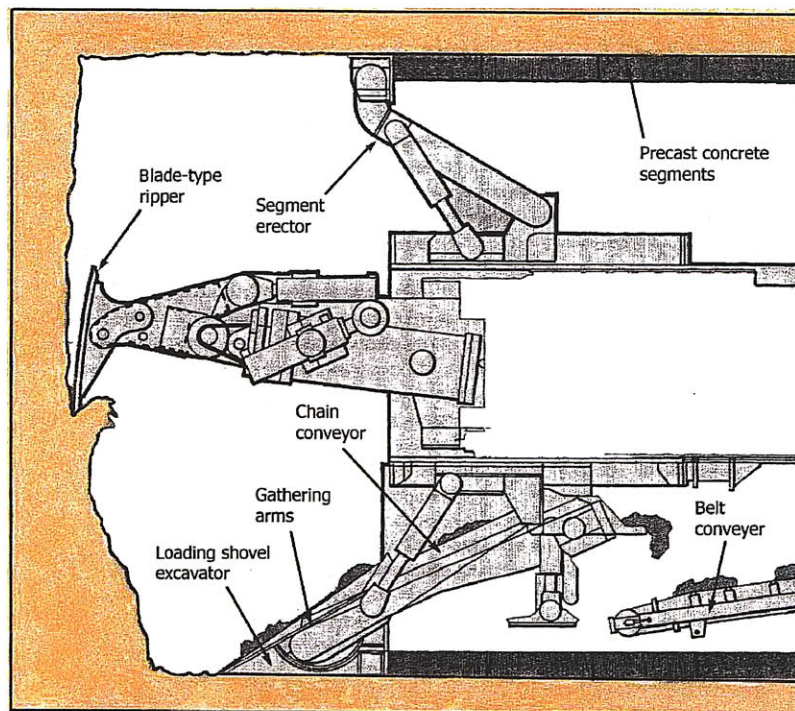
Non-shielded TBM with expanded pre-cast concrete ring segments used in the tunnel from Rotarelle and San Vittore part of the Naples Aqueduct project (Wallis, 1991)
